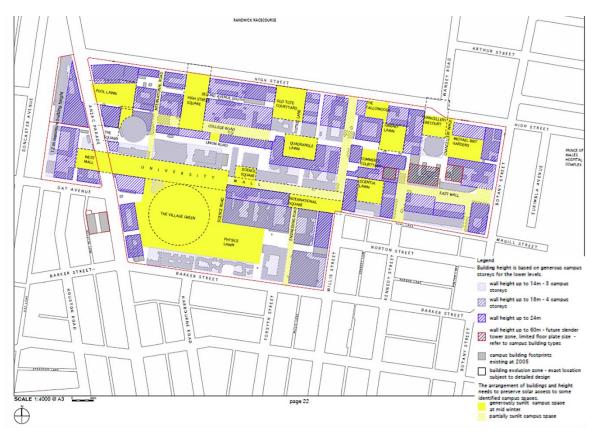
Building heights (Source: UNSW Campus 2020 Master Plan/RDCP 2013)
